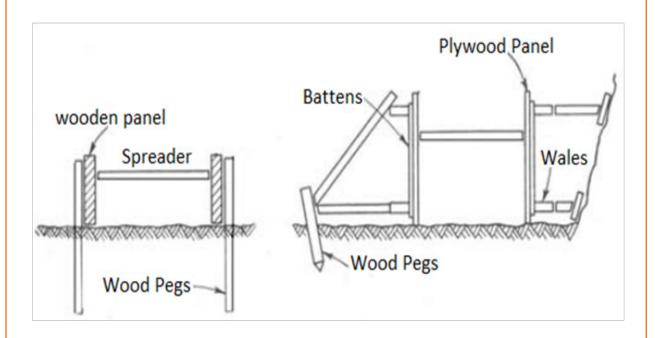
Continuous Footing Formwork: Footing Formwork Components for Shallow Footing
